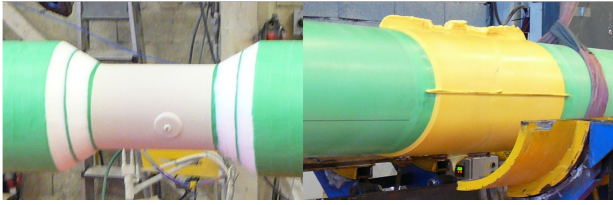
Welded pipe section, (left) after application of the corrosion protection layer, clearly showing the chamfers and (right) after application of a PP field joint coating.
